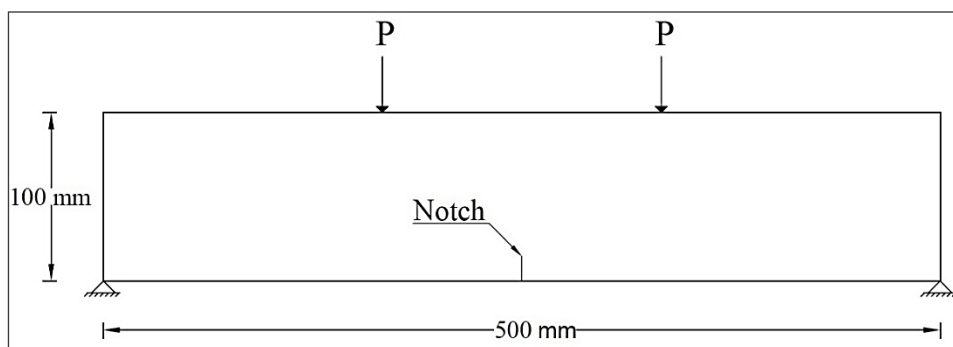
Concrete prism model dimensions, loading, and boundary conditions
